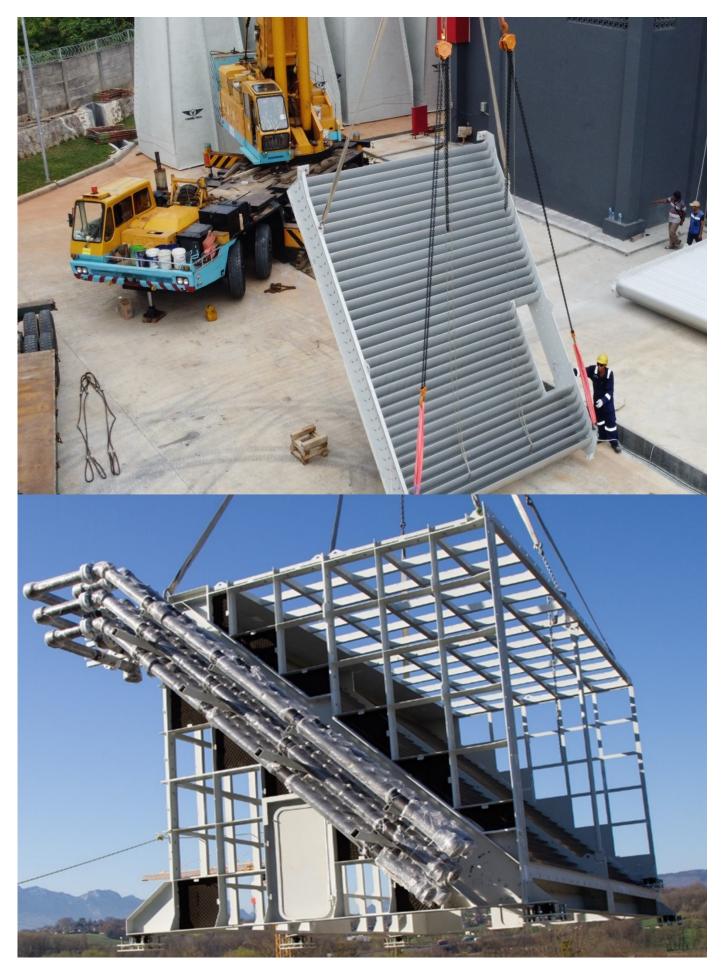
Turning section doors: top - vane door, bottom – maintenance door.
